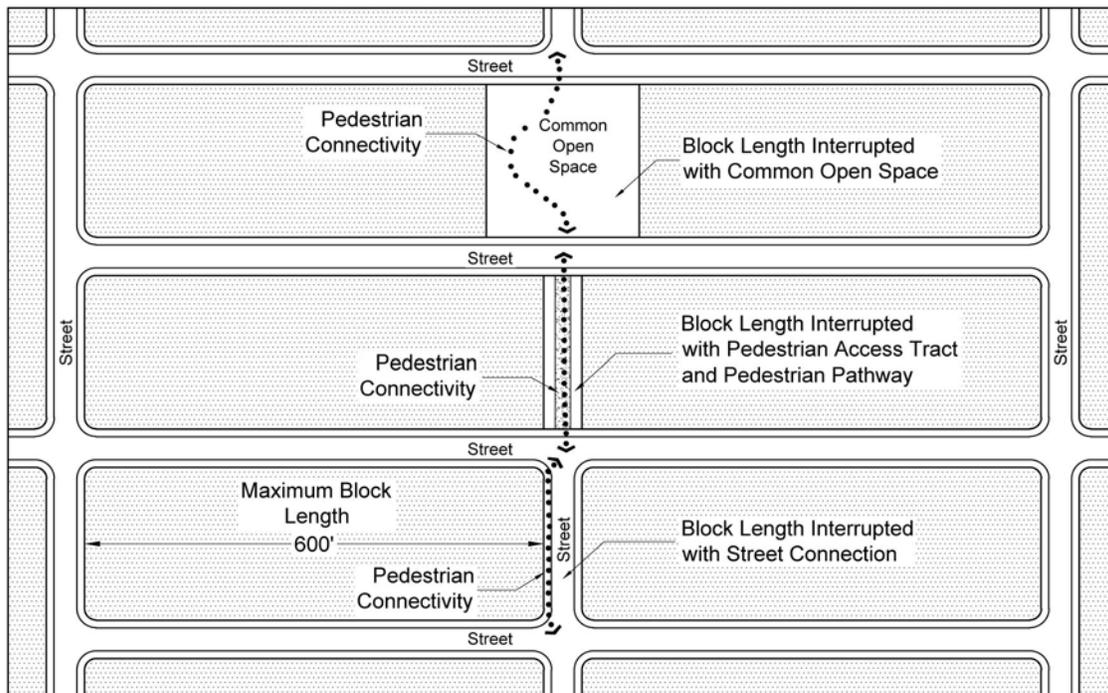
(a).2. – Site Layout – Block Length Standards
